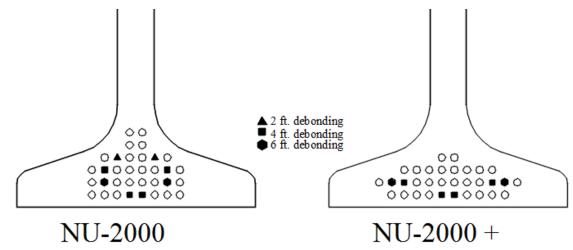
NU-2000 Girder Design Debonded Strands with Span Length of 120 ft
